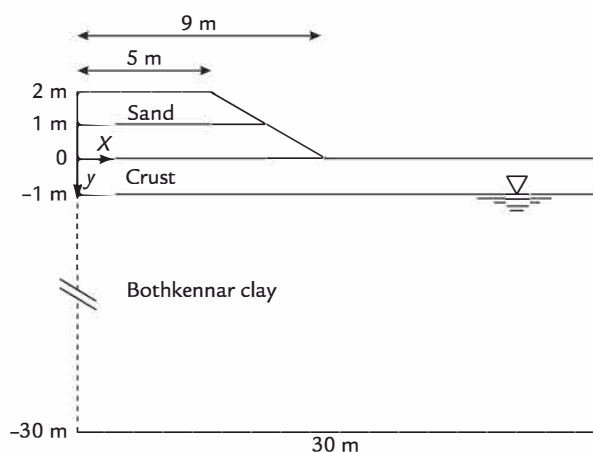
Geometry of benchmark embankment and assumed soil profile.
